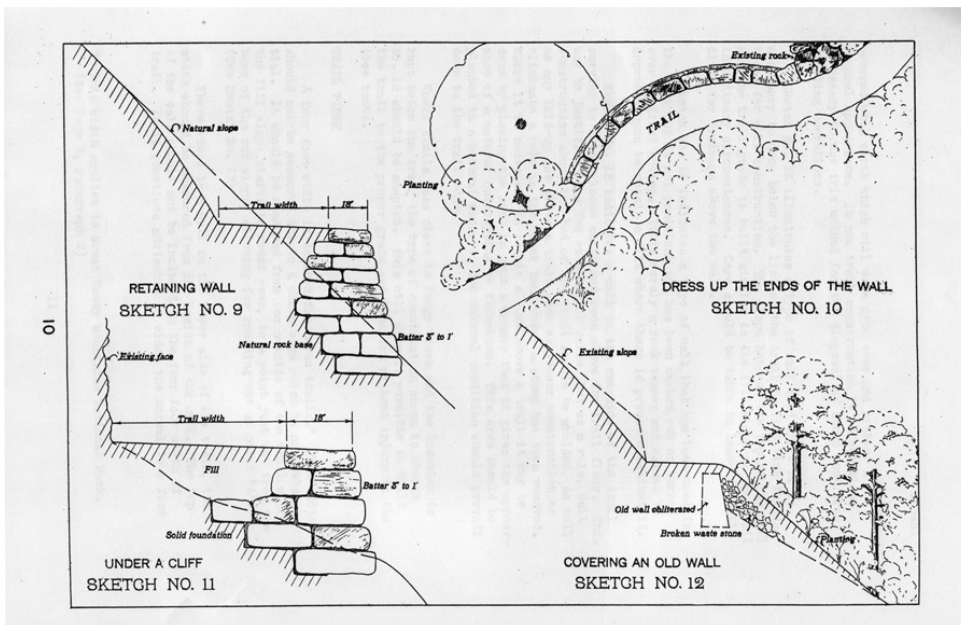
U.S. Department of the Interior 1937 manual, *Construction of Trails*, illustrates proper construction of retaining walls. The structure widens under the tread for durability and drainage. (Shenandoah NP Archives)
